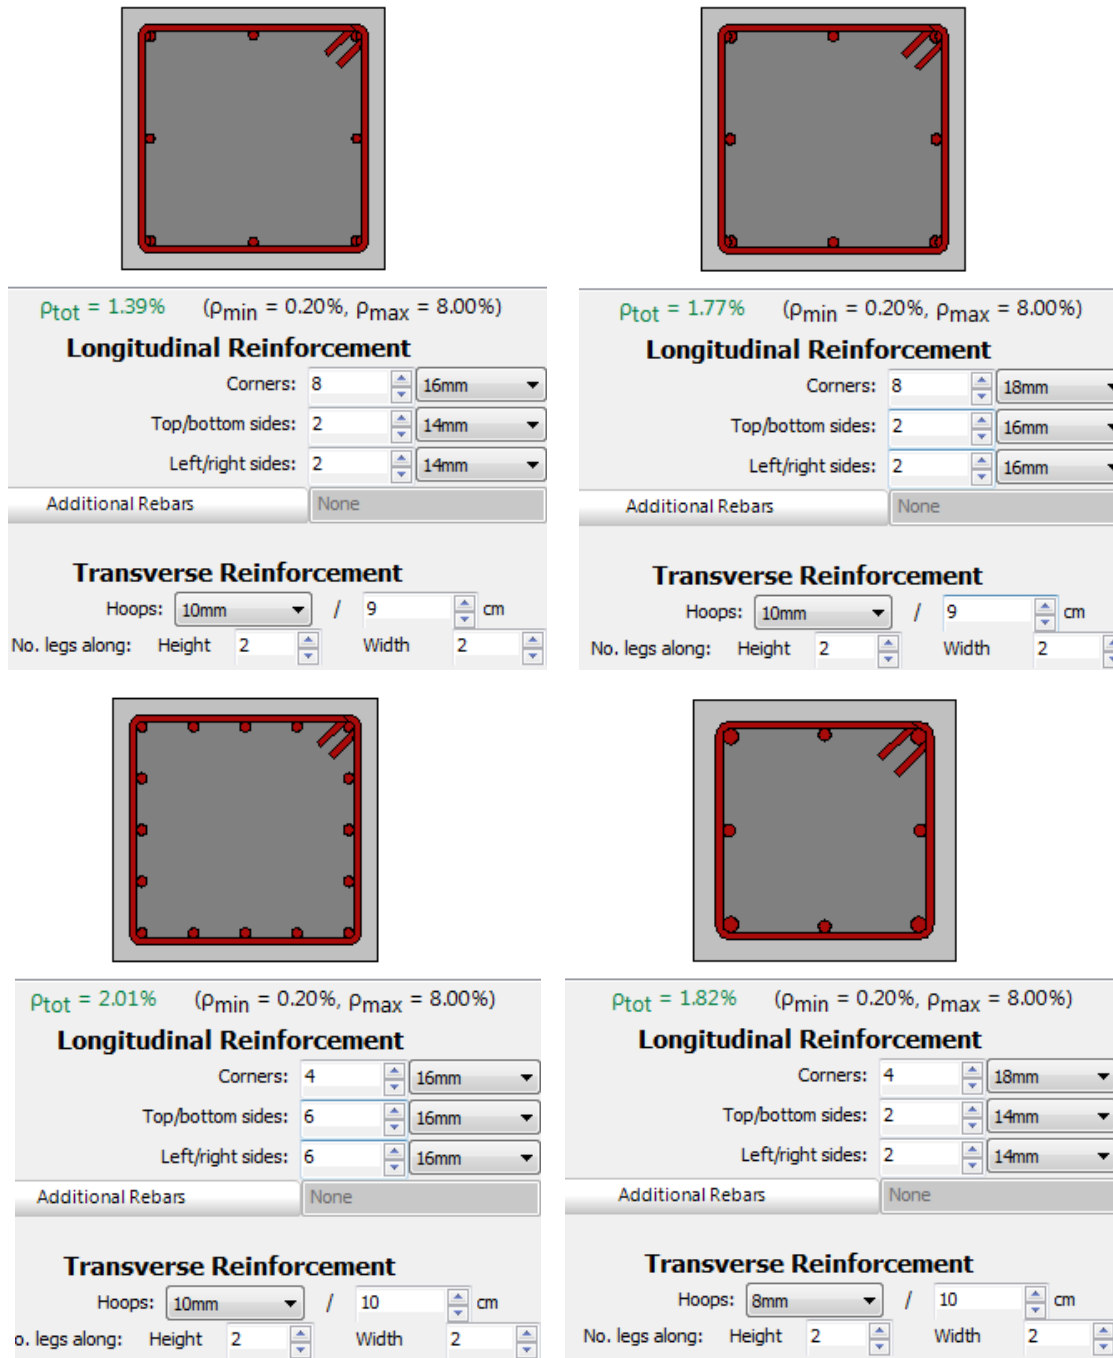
Typical column Section 400X400 mm & 35X35 mm
